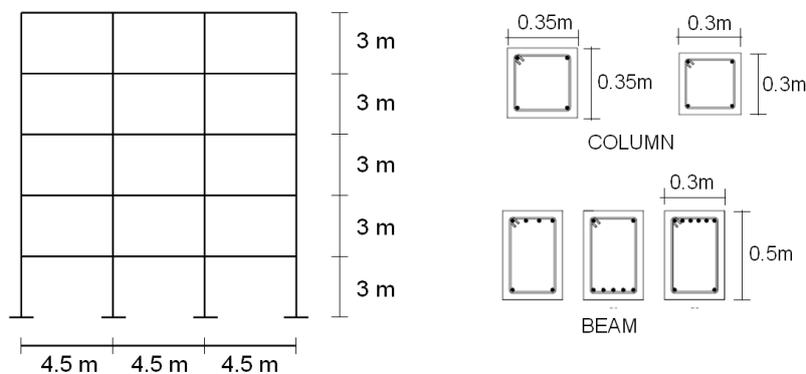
Elevation view of the RC frame and details of typical column and beam cross sections.
